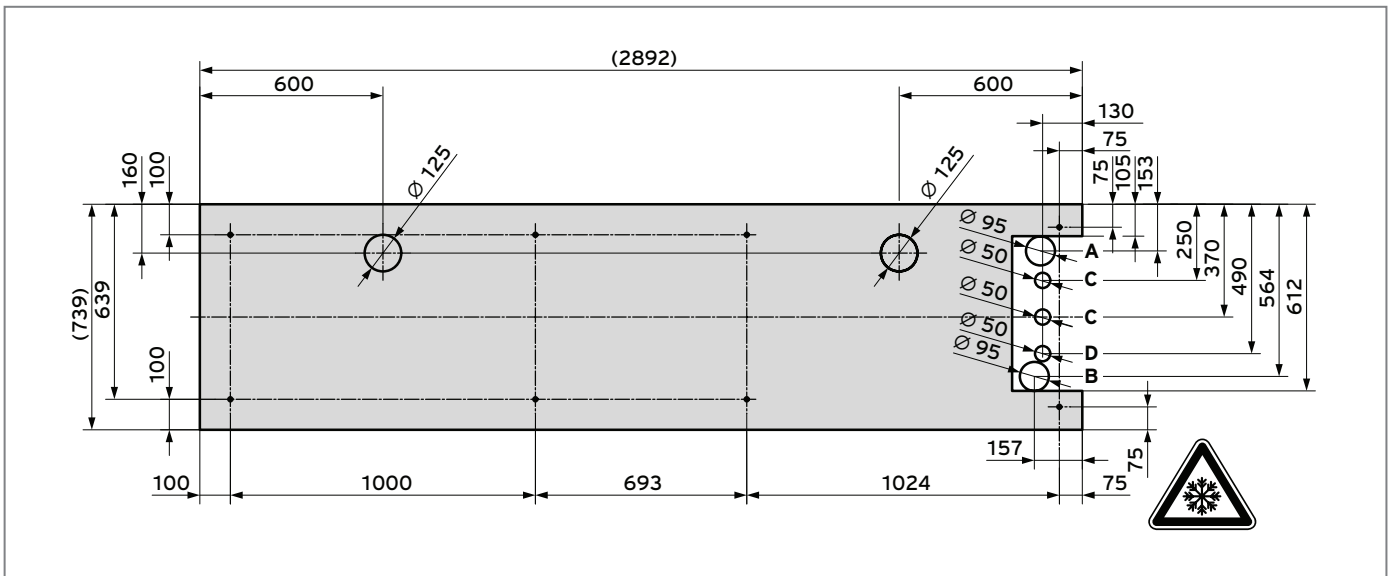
Foundation of the connection dimensions for two aroCOLLECT outdoor units for the installation set (0020205408) with the Tichelmann system
